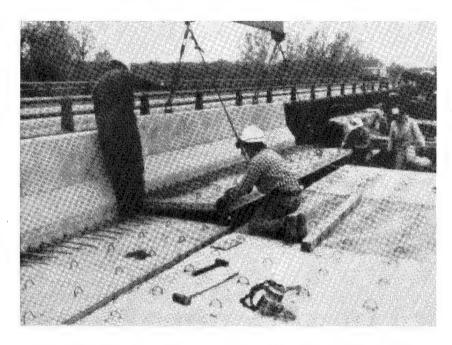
Workers placing a precast edge panel with a safety parapet on the Kansas River Bridge (from Slavis 1985)
